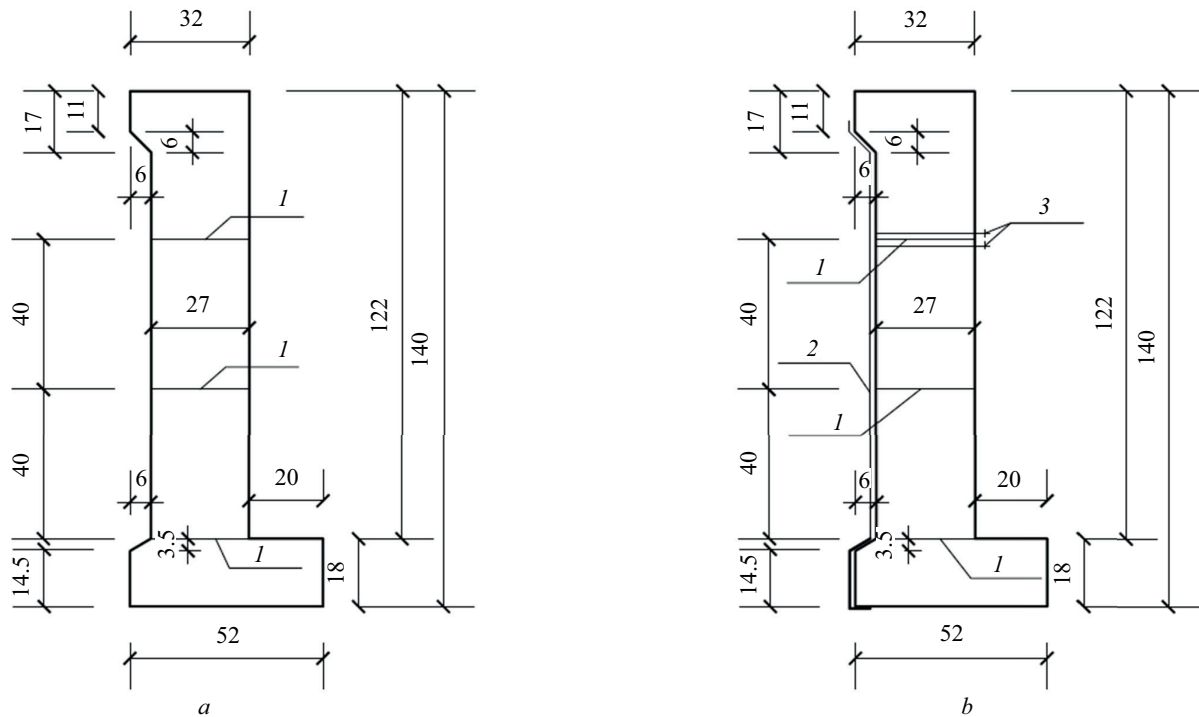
Models of the reinforced concrete machine hall headwall (dimensions in cm): a — unreinforced; b — reinforced with carbon tape; 1 — construction joints between blocks; 2 — carbon composite tape; 3 — anchors
